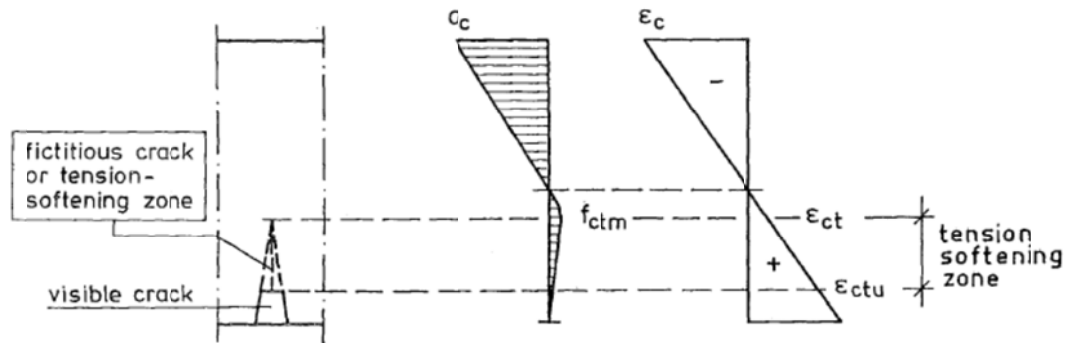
The fracture zone. (Pruijssers, 1986).
